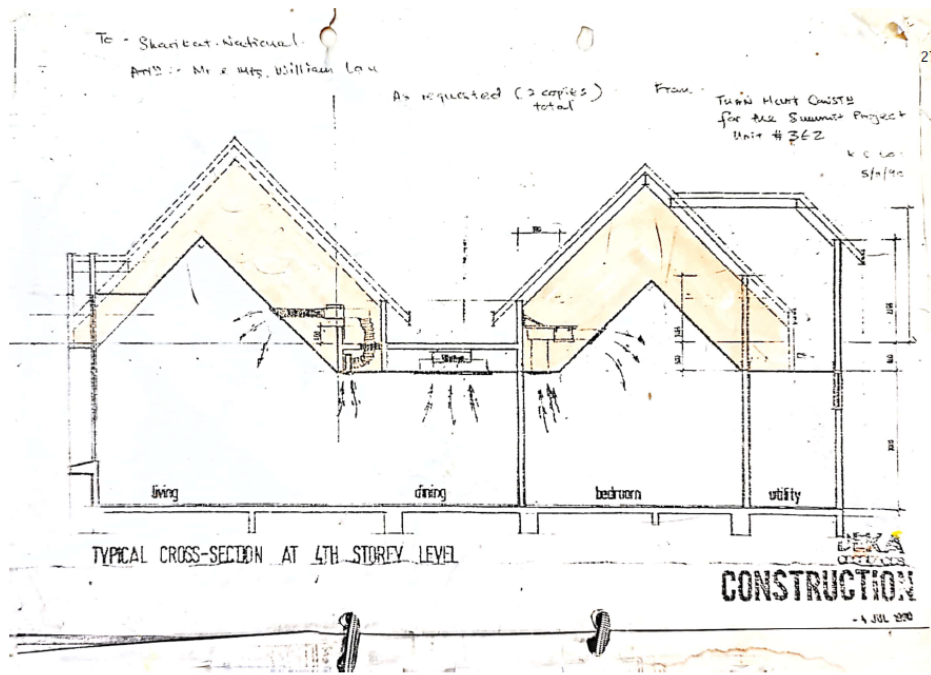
Cross-section plan from Tuan Huat Construction dated 5 November 1990
